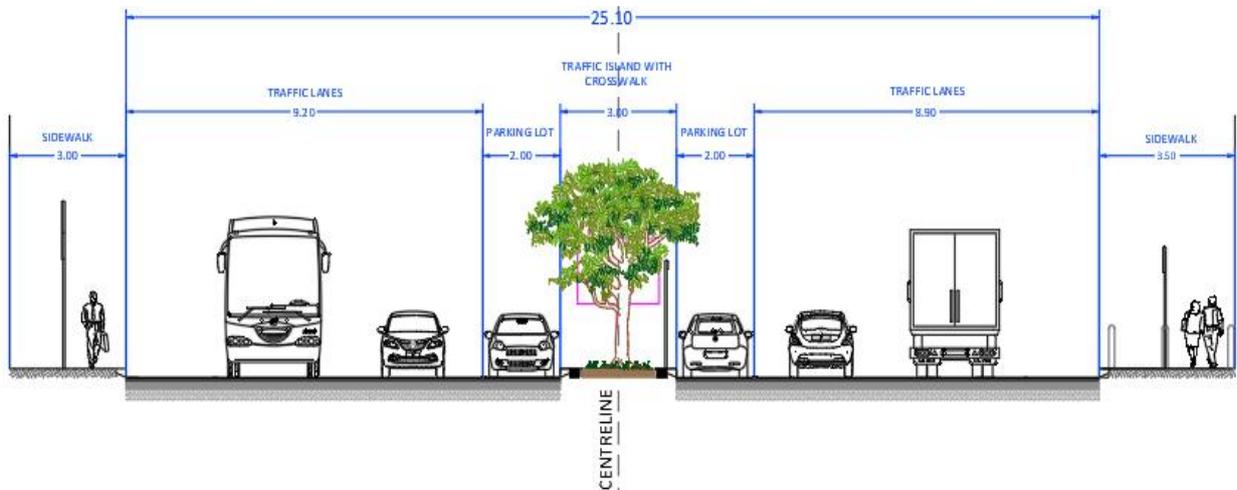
Cross section, section P-P', intersection II and III - Viale Papa Giovanni XXIII.
